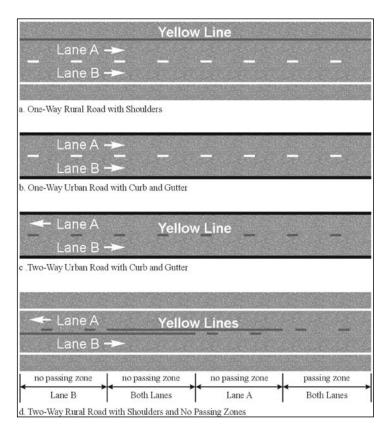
Common U.S. longitudinal pavement markings for two-lane roads.
